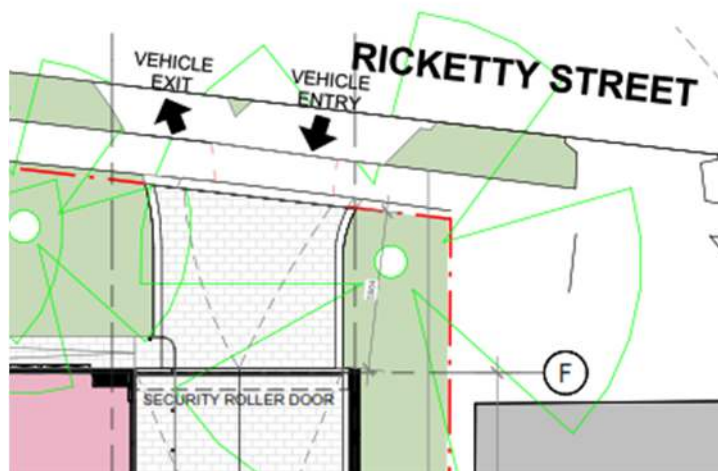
Extract from ground floor plan with design of Ricketty Street driveway (supplied by the applicant)
